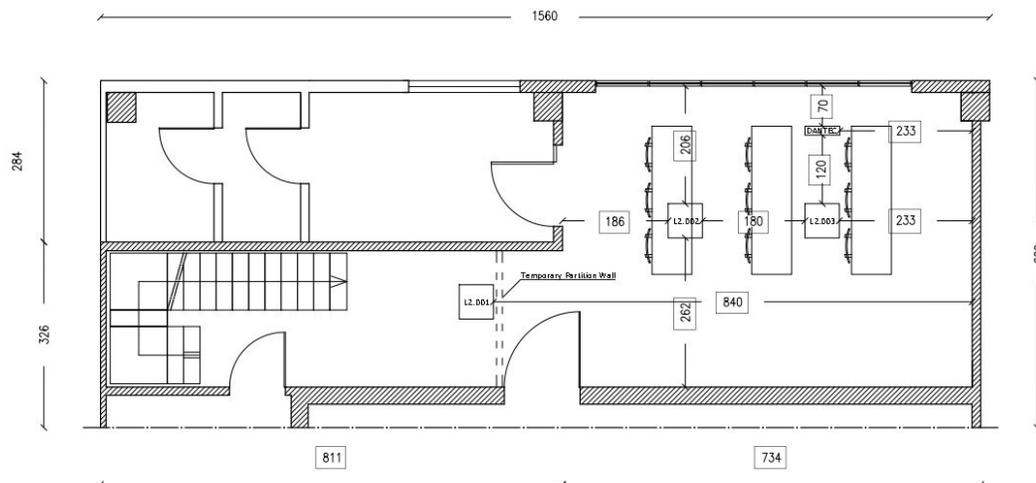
Indoor layout of the monitored office room. DanteC station and AC units are also shown in the plan
